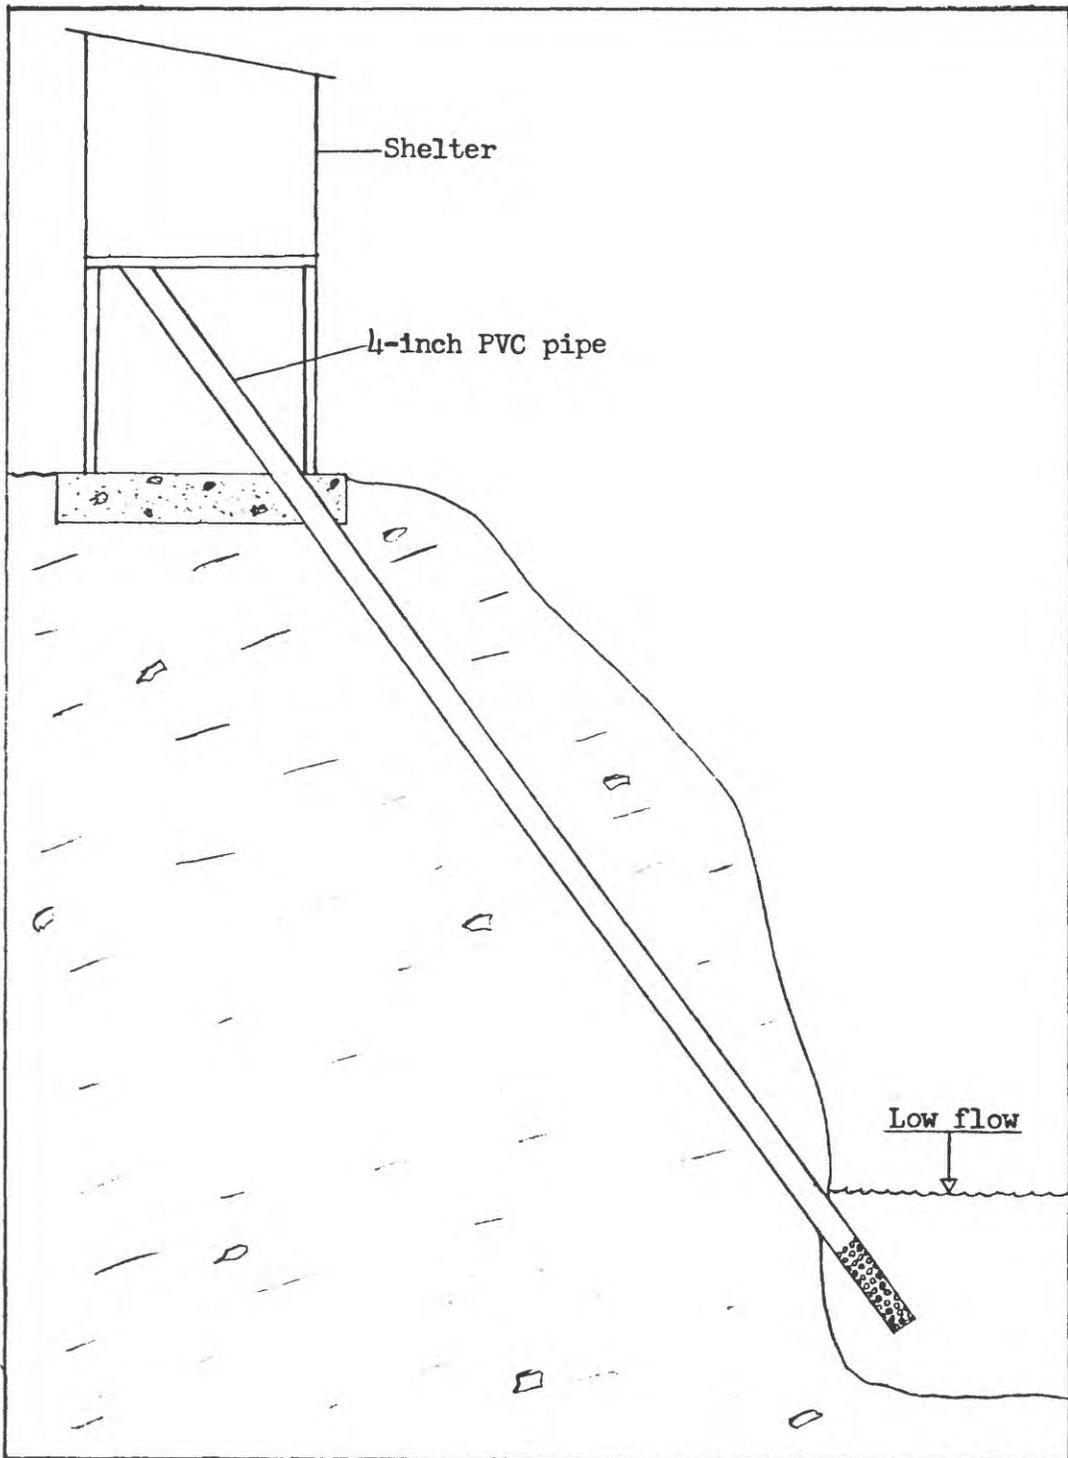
Streambank installation of shelter and sensor housing for the mini-monitor on a steep bank.
